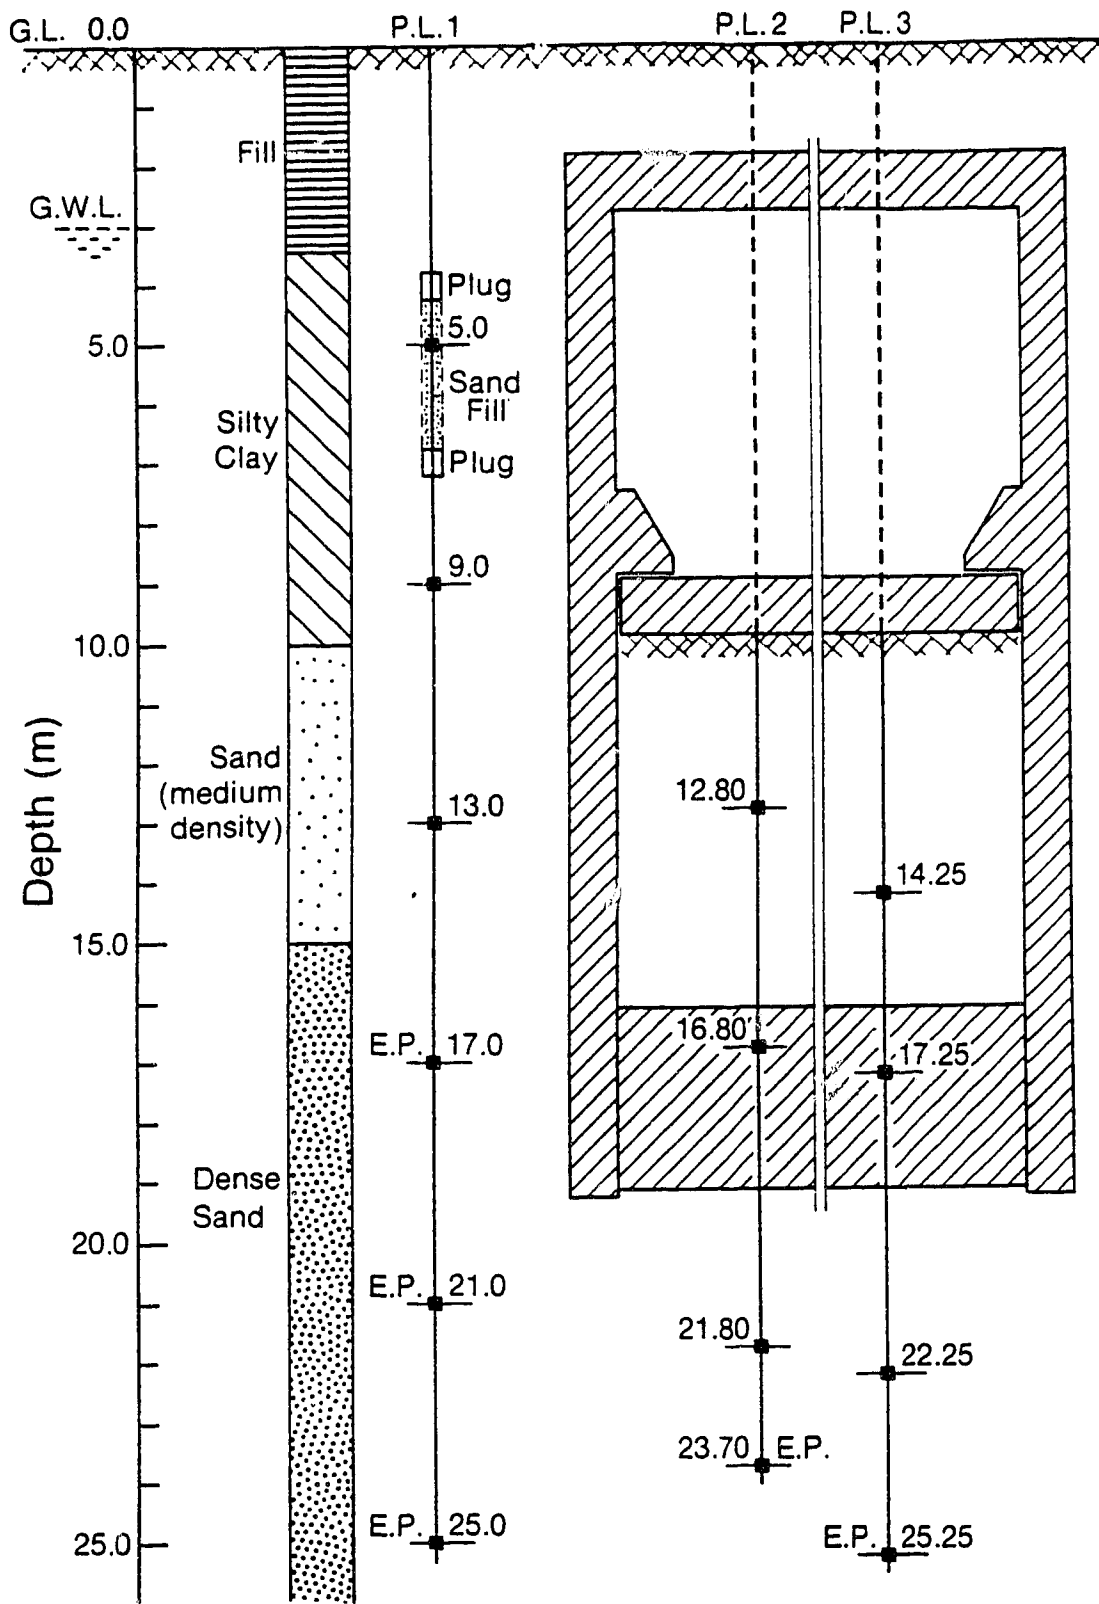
The Piezometer Lines Details at the Orabi Station Test Section
